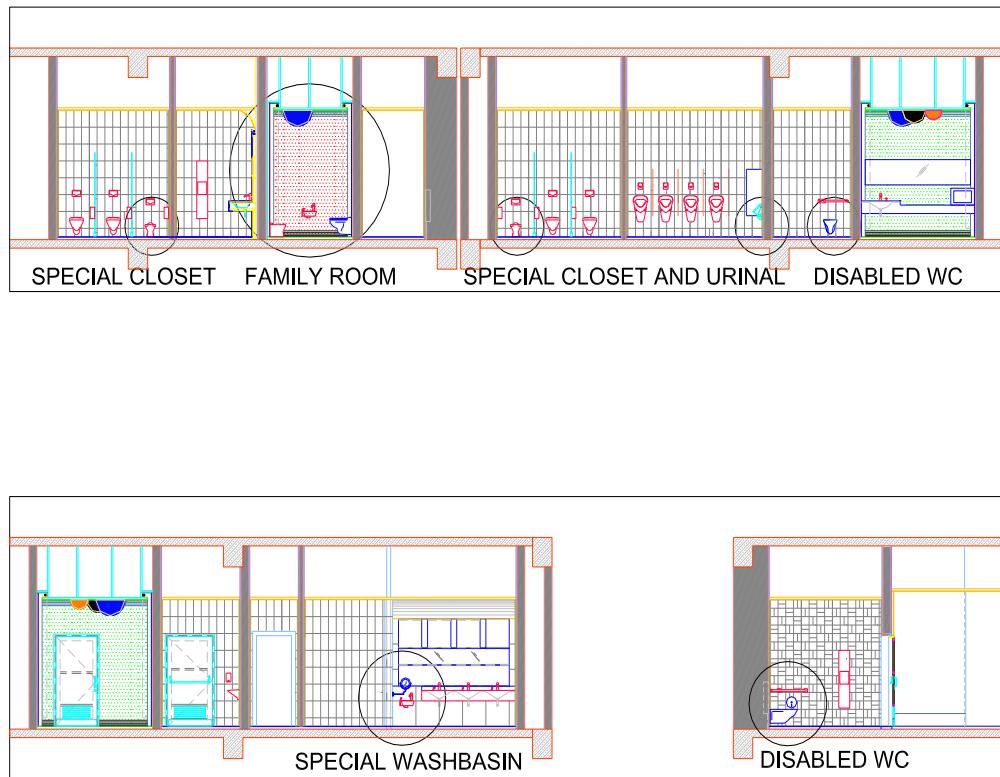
Typical sections of the rest rooms showing details, in Forum Istanbul.
